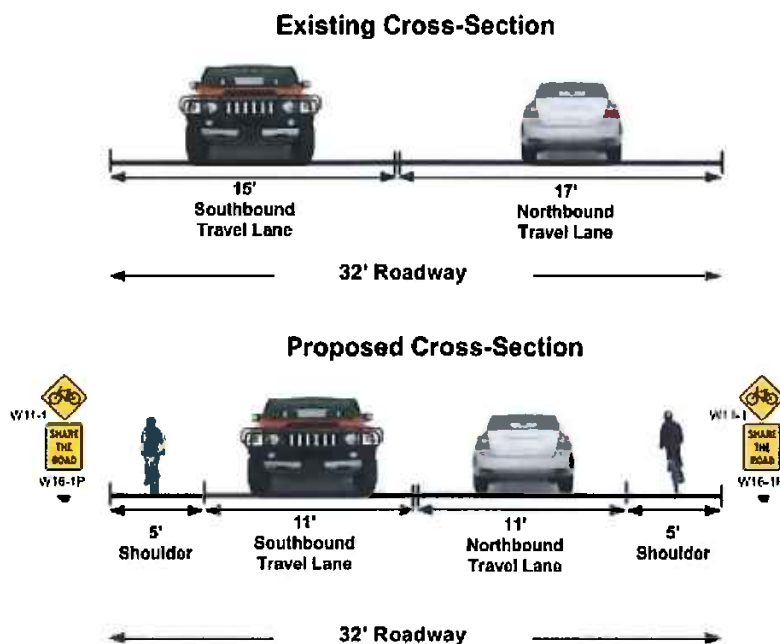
Shoulders on Throckmorton Street between Monmouth Avenue and Rhea Street
